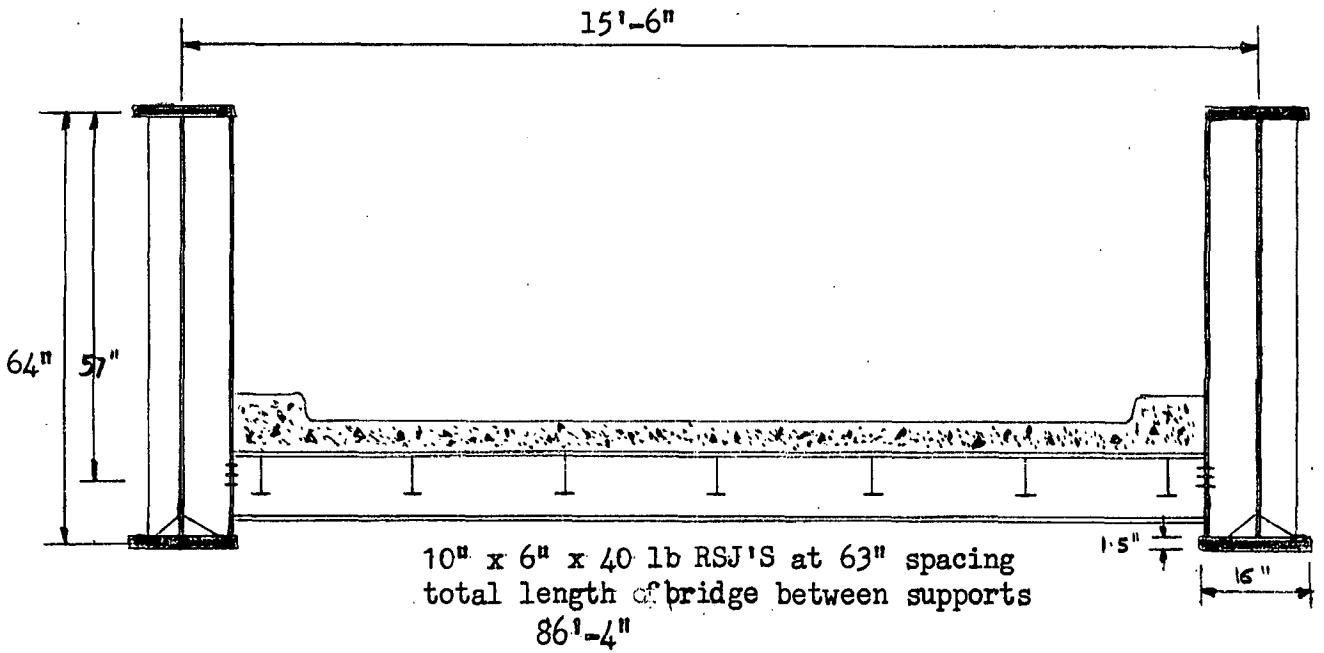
Cross section of the ferry terminal bridge at Devonport, Tasmania
